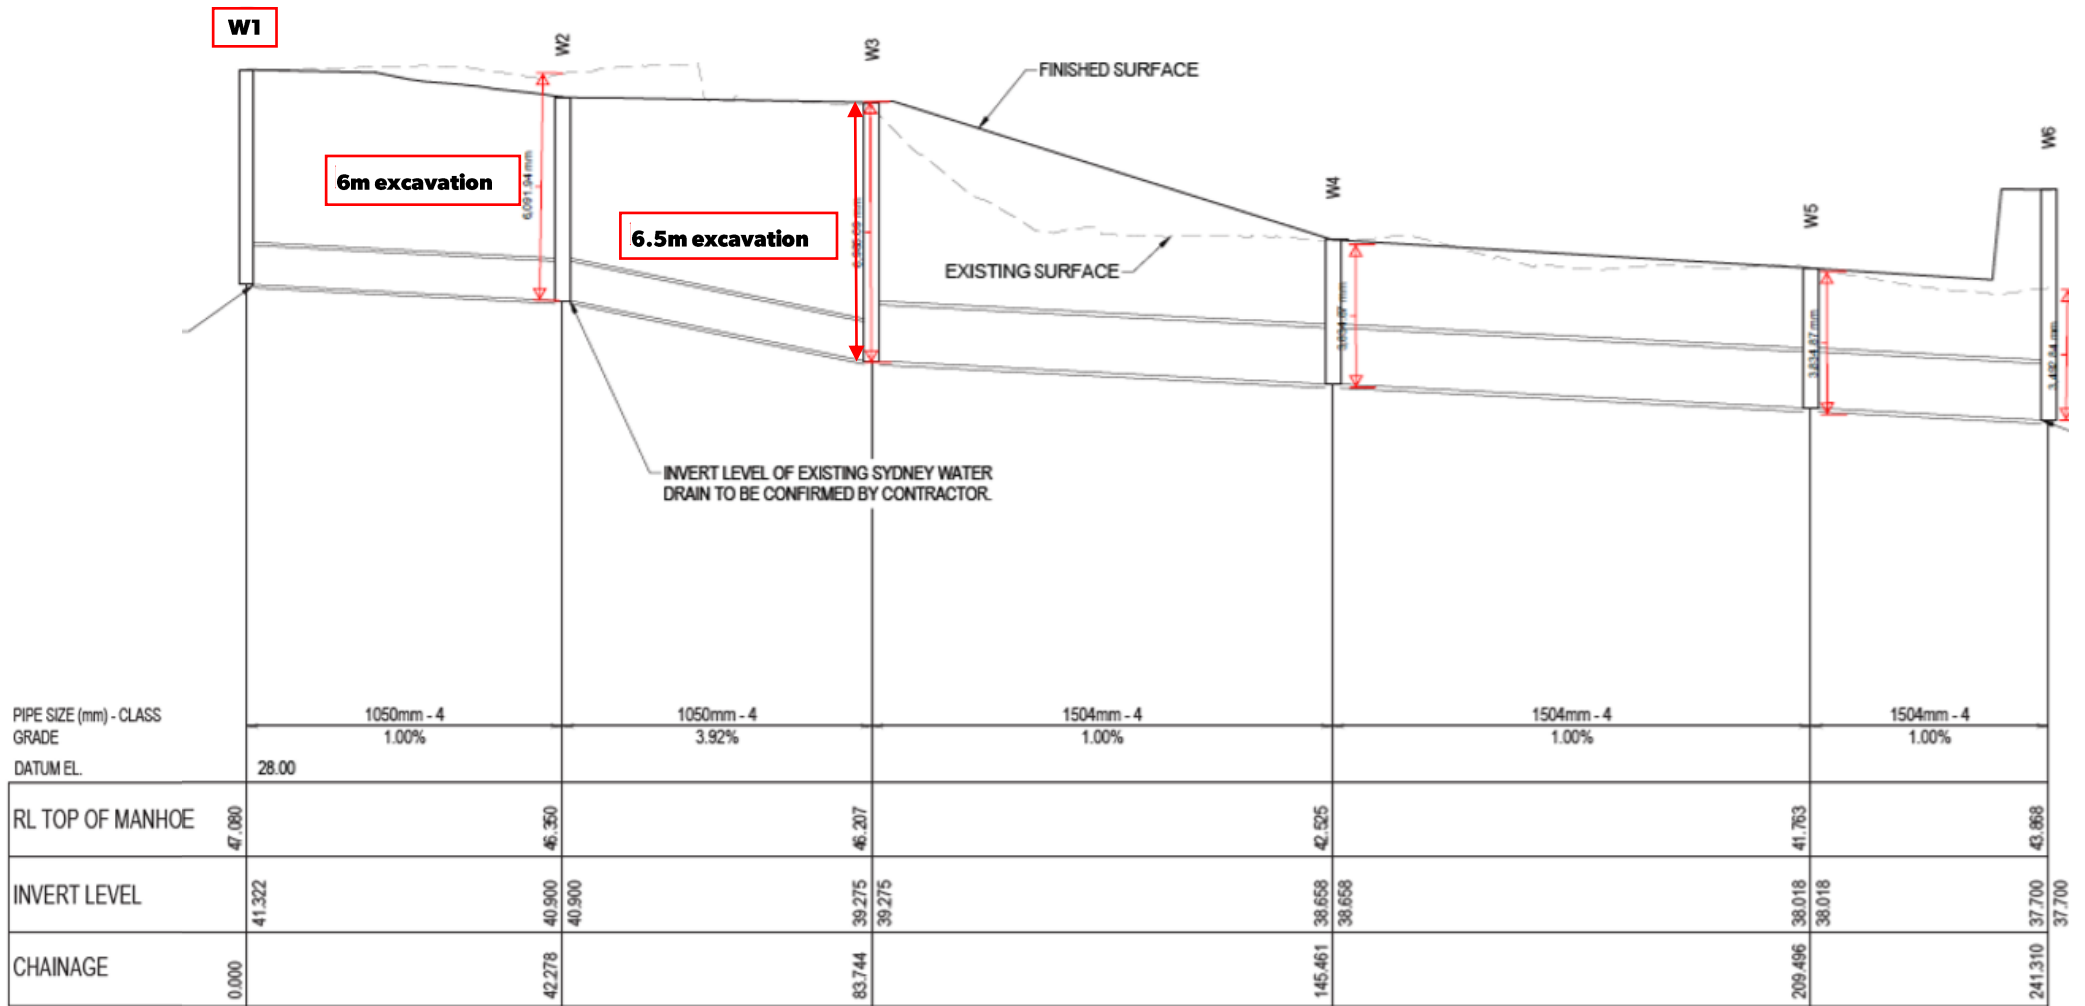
| Stormwater diversion – Longitudinal section (Source: Applicant’s Response to Submissions)
